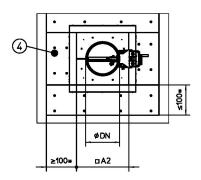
Installation remote from lightweight partition walls, wall penetration
